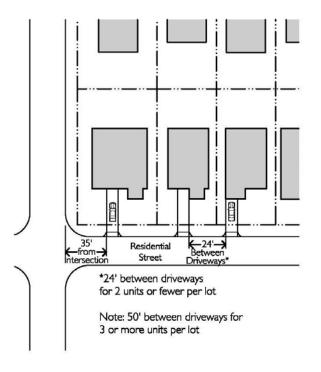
C.3.a. Driveway Separation for Boulevards, Avenues, and Collectors
